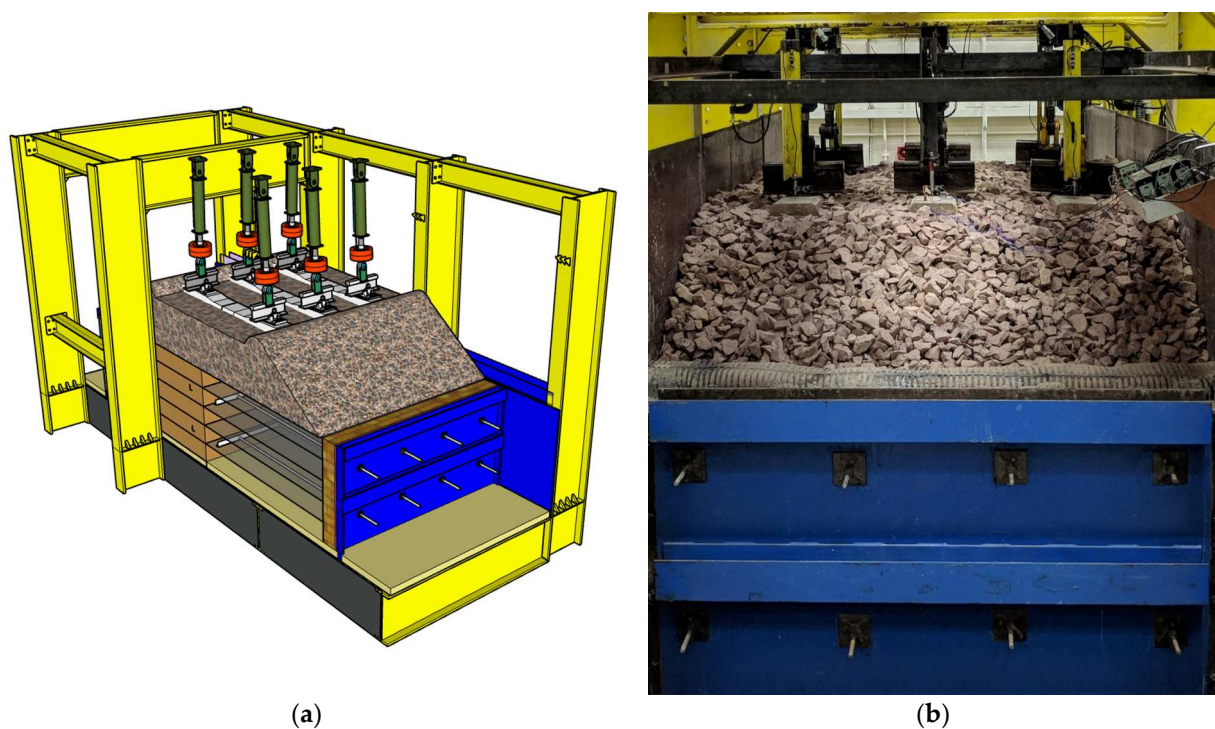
The layout of the ballasted track on the GRS-RW system. (a) A 3D sketch and (b) a photo of the side view.
